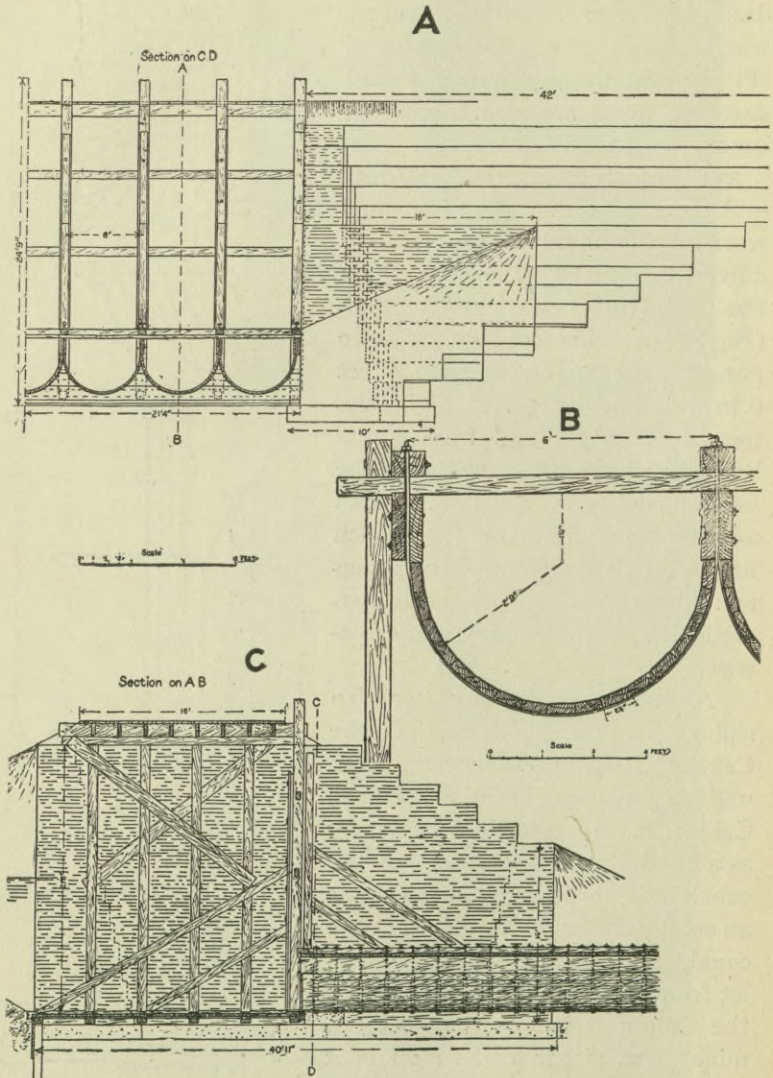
PLATE XXIV.—CENTRAL IRRIGATION DISTRICT CANAL. ELEVATION AND CROSS-SECTION OF STONY CREEK CULVERT.
